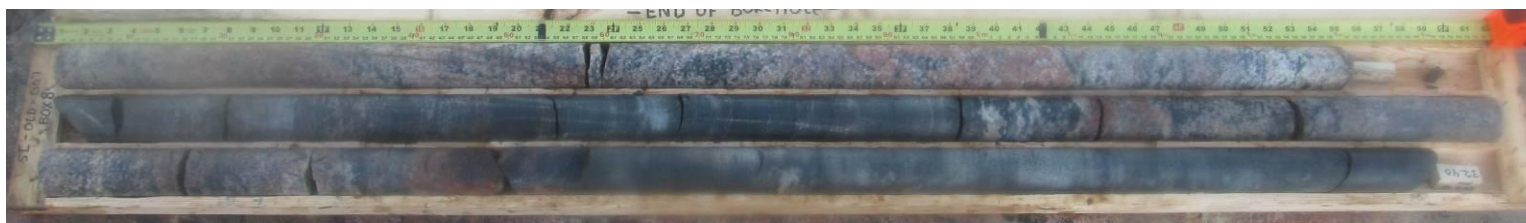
Core Box #8 of 8 (Runs 10-11, 28.1m – 32.4m)
